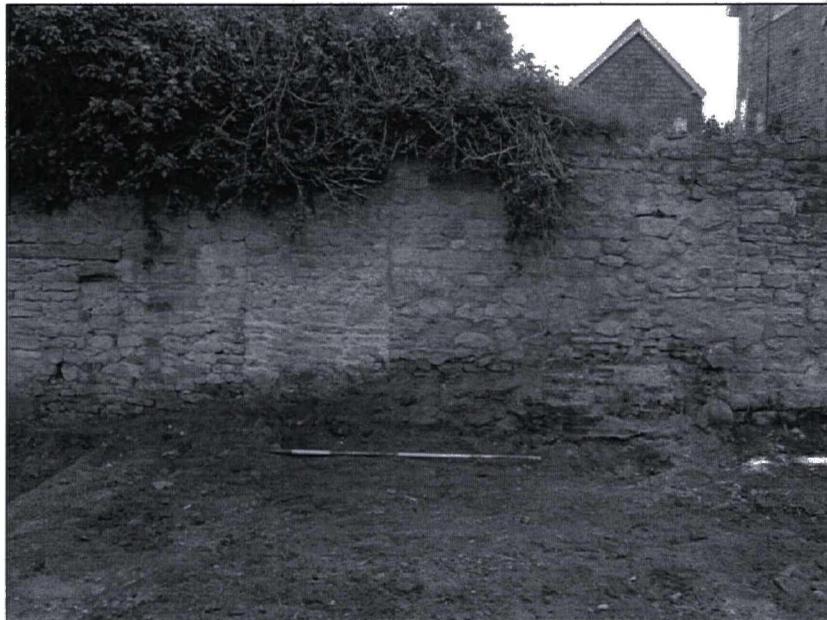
view of the central section of the east wall of the former stables/cowhouse with a second blocked doorway below the ivy, looking east
